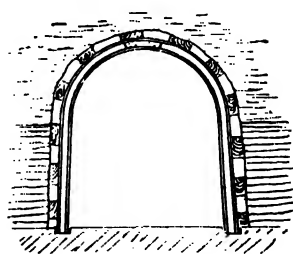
Illustrating method of using Iron or Steel Rails to support Roof and Sides
